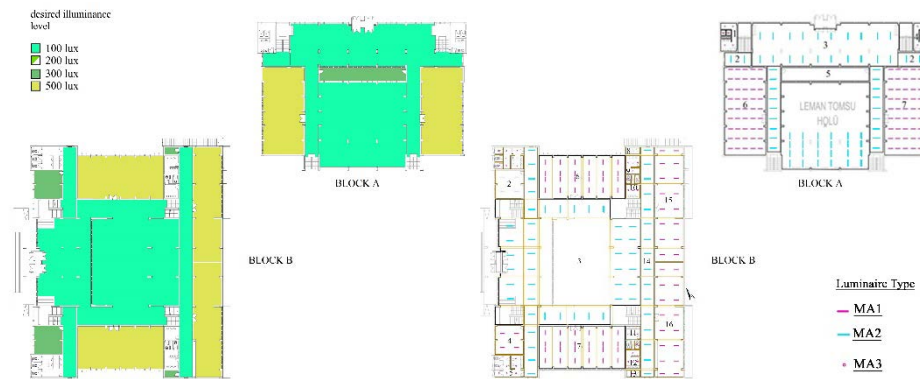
Second Basement Floor Plan and Existing Artificial Lighting Layout
